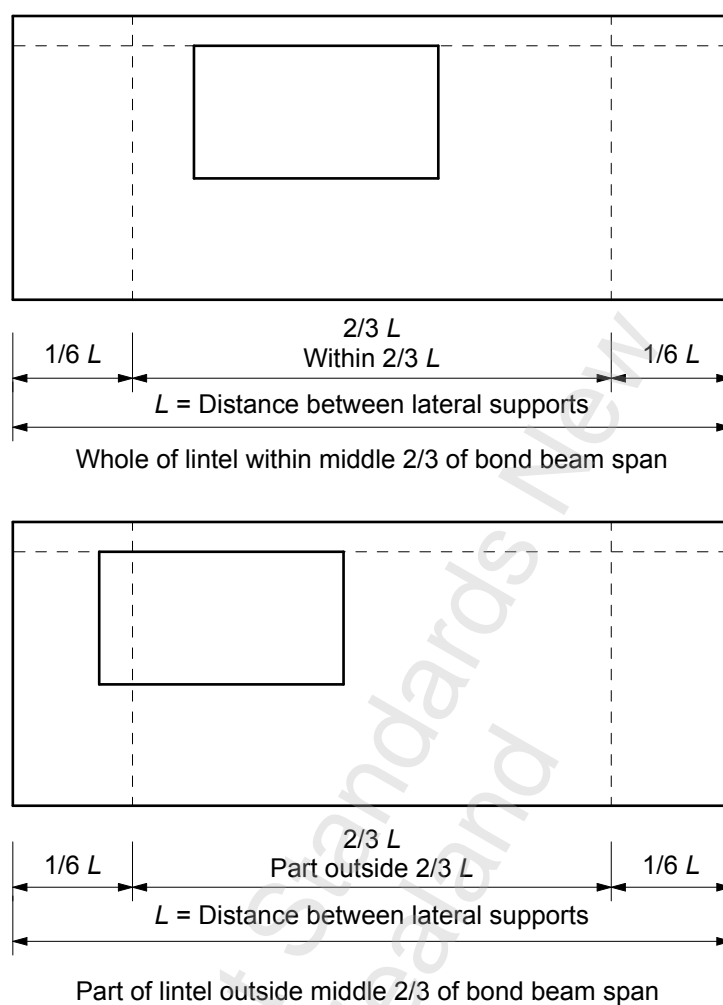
Concrete lintel within and outside middle two-thirds of bond beam span
